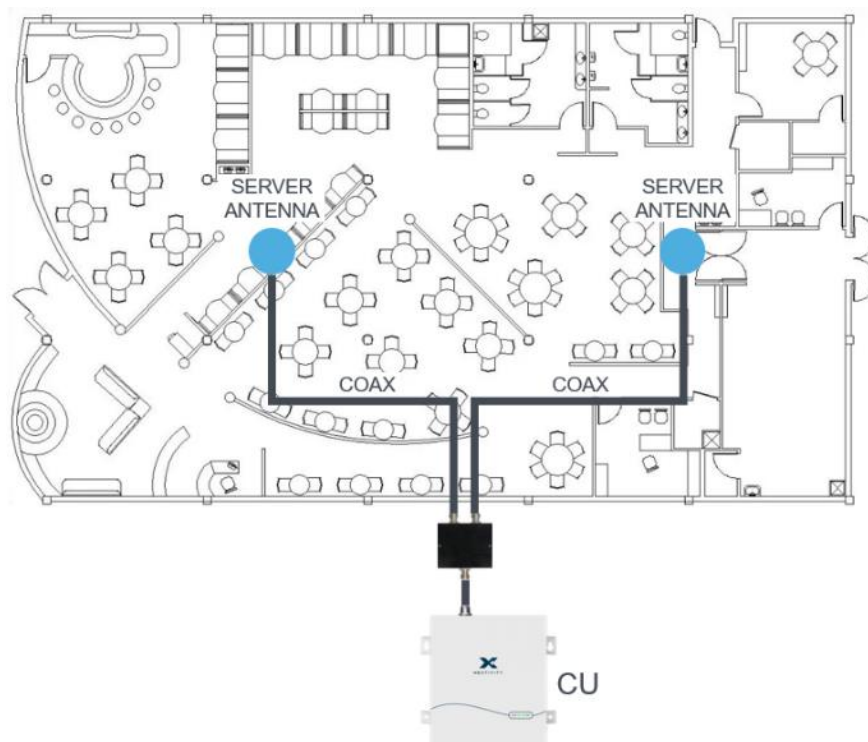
Example server antenna layout. Two ceiling-mounted omnidirectional antennas connected via coax to a CU, distributing coverage across an open office floorplan.
